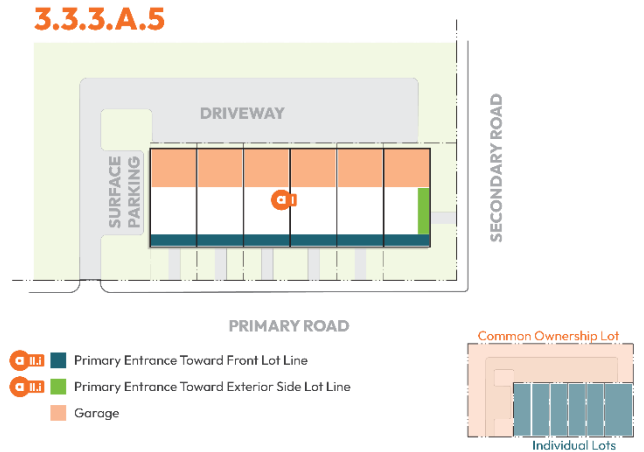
Townhome Orientation - Street Right-of-Way, No Alley
